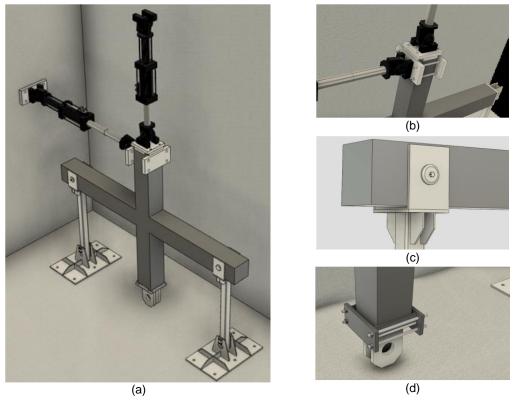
Example of test setup for cyclic tests: (a) experimental setup overview, (b) actuator-column connection detail, (c) beam support connection detail, (d) base of column detail
